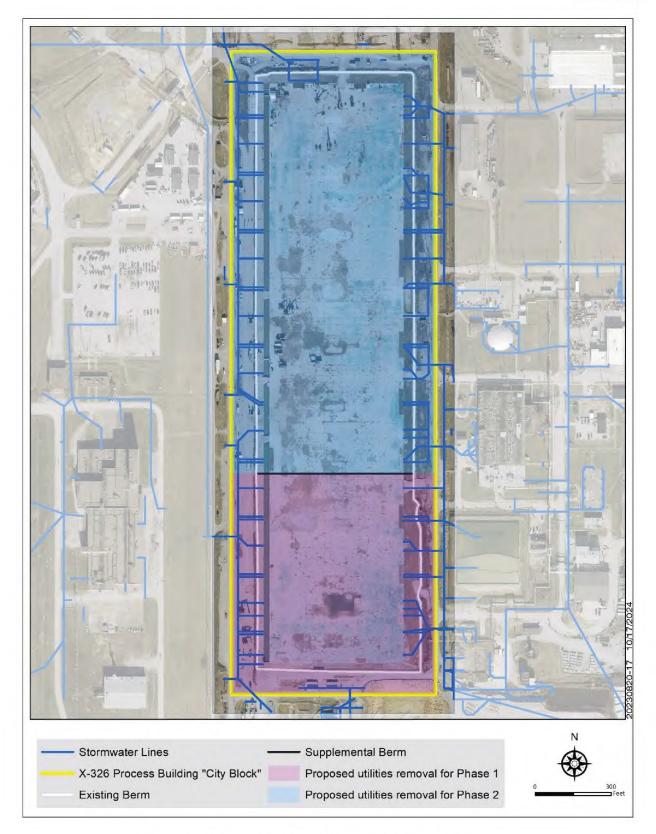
Underground Utilities – Stormwater and Drain Lines
